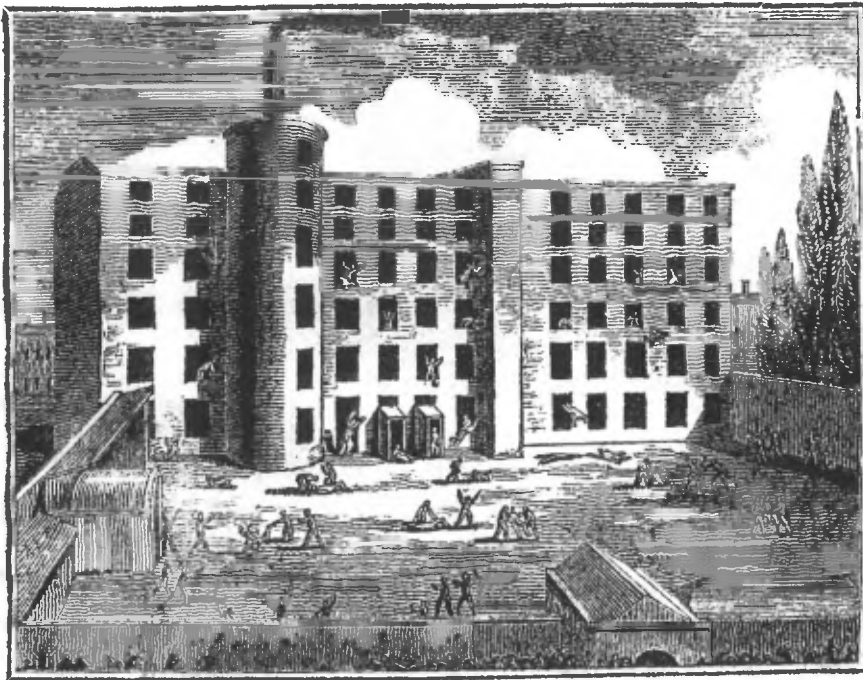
Islington Mill, Salford, was built in 1823 by the Manchester building contractor David Bellhouse, but due to poor casting techniques used in making the single row of iron pillars which held up the floors, collapse of an upper floor unable to bear the weight of the heavy machinery placed on it caused a general failure of all floors at the north end of the building, to the left of the combined chimney and stair tower, in October 1824. The engraving shows the mill, the now demolished stair tower and chimney and the square projection of the privy tower.
